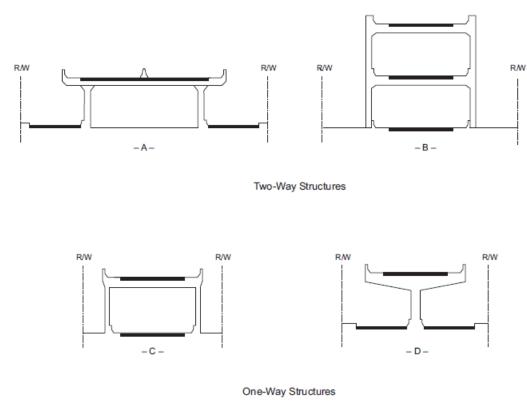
Typical Cross Sections for Elevated Freeways on Structures without Ramps
